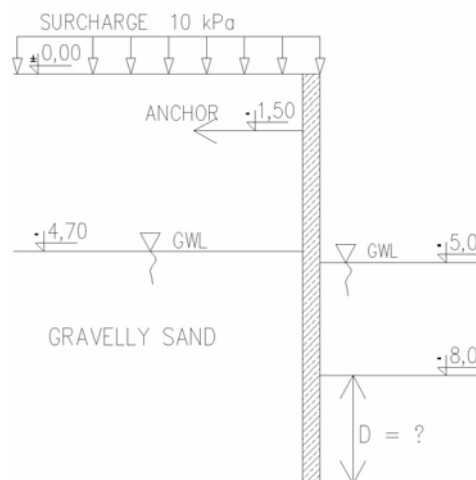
Anchored sheet pile retaining wall, 2nd example case.
